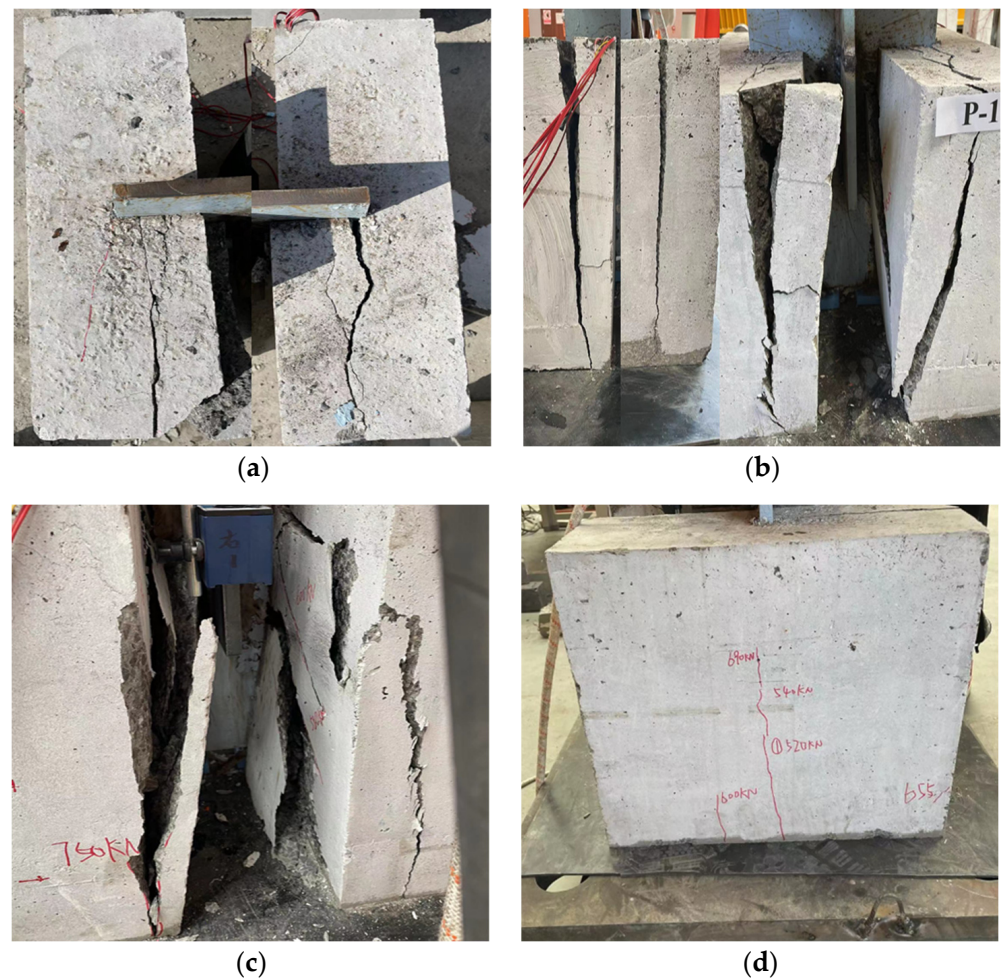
Overall failure mode of P-18-S specimen in static push out test. (a) Specimen top; (b) specimen face; (c) inner side of specimen; (d) specimen outer side.
